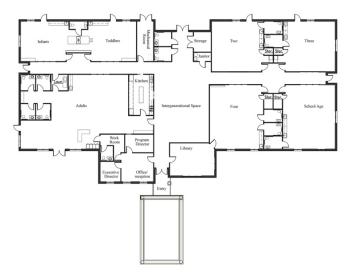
Basic floor plan (10717 SQ. FT.) - plan drawn by Mather Architects
